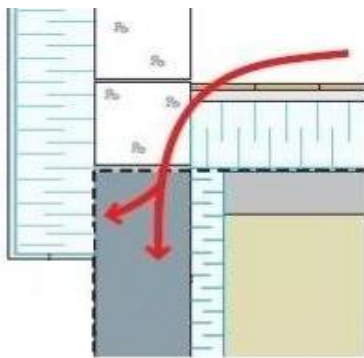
The proper insulated connection of foundation wall with the exterior wall of building.
